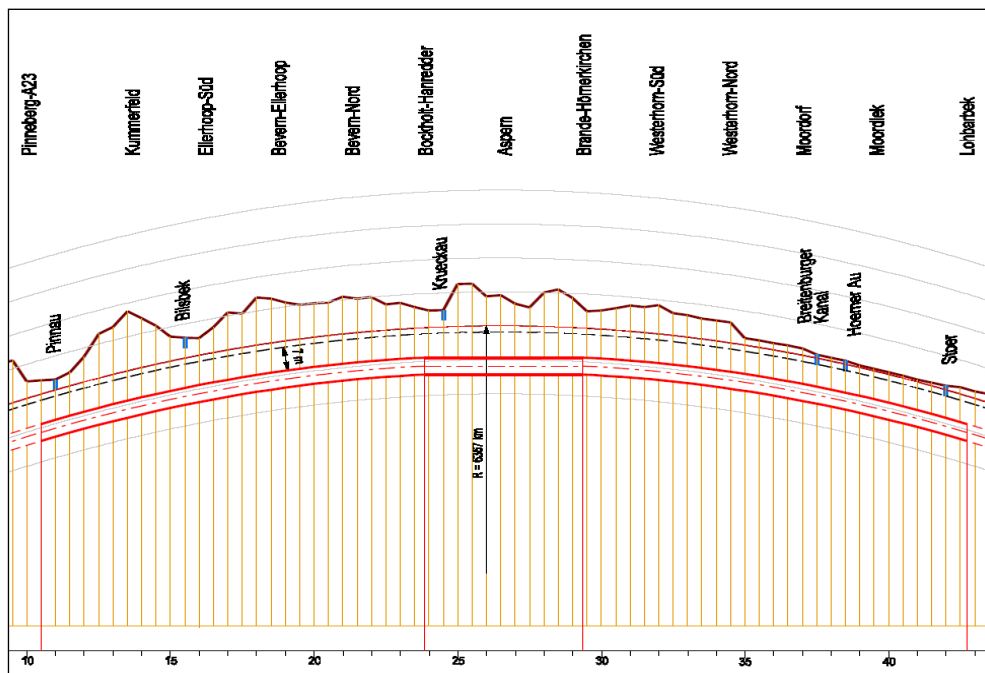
Elevation of the main tunnel at the potential ILC site at DESY in Hamburg.
